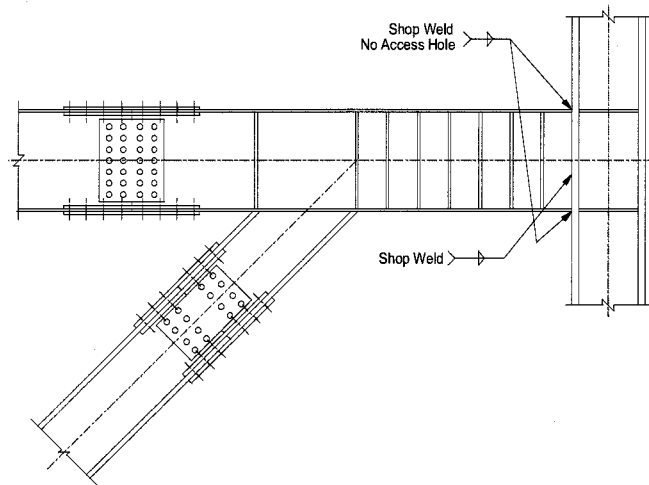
Overall view of shop welded link-to-column connection.
